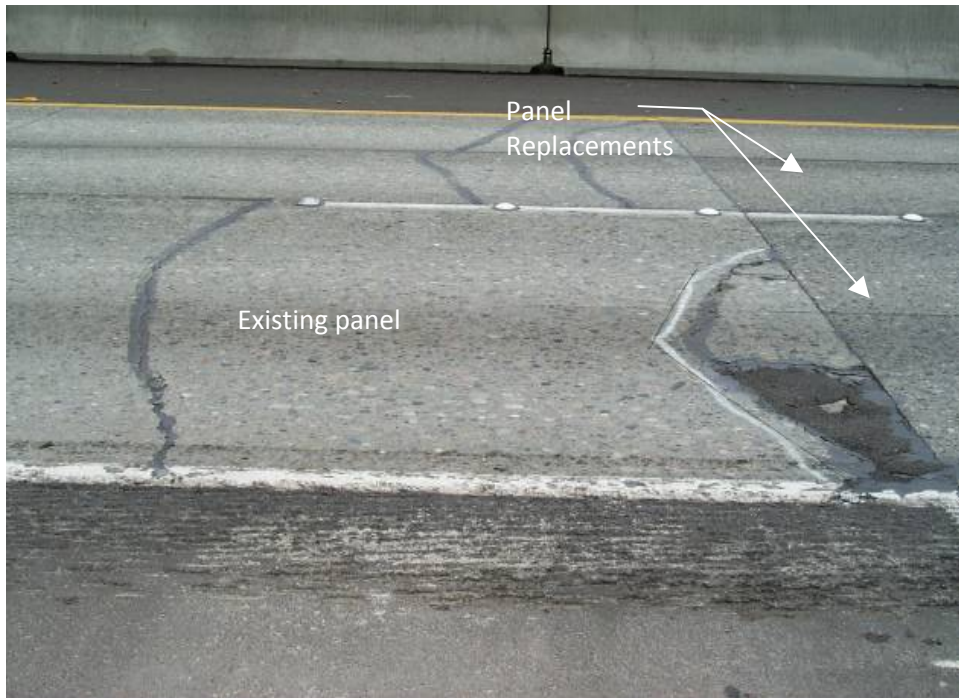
Typical failure of existing panels adjacent to panel replacements.
